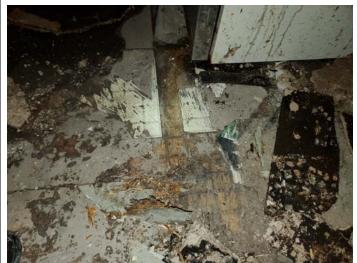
12"x12" brown square pattern flooring and associated mastic in kitchen, pantry and hallway is ACM.
